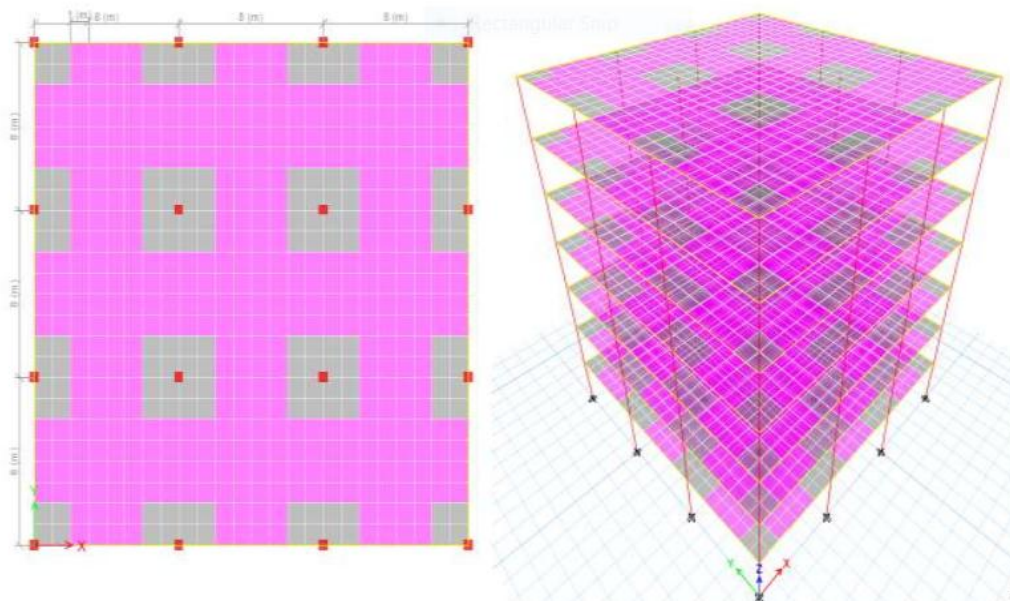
Snapshot of ETABS window of RC flat slab building
